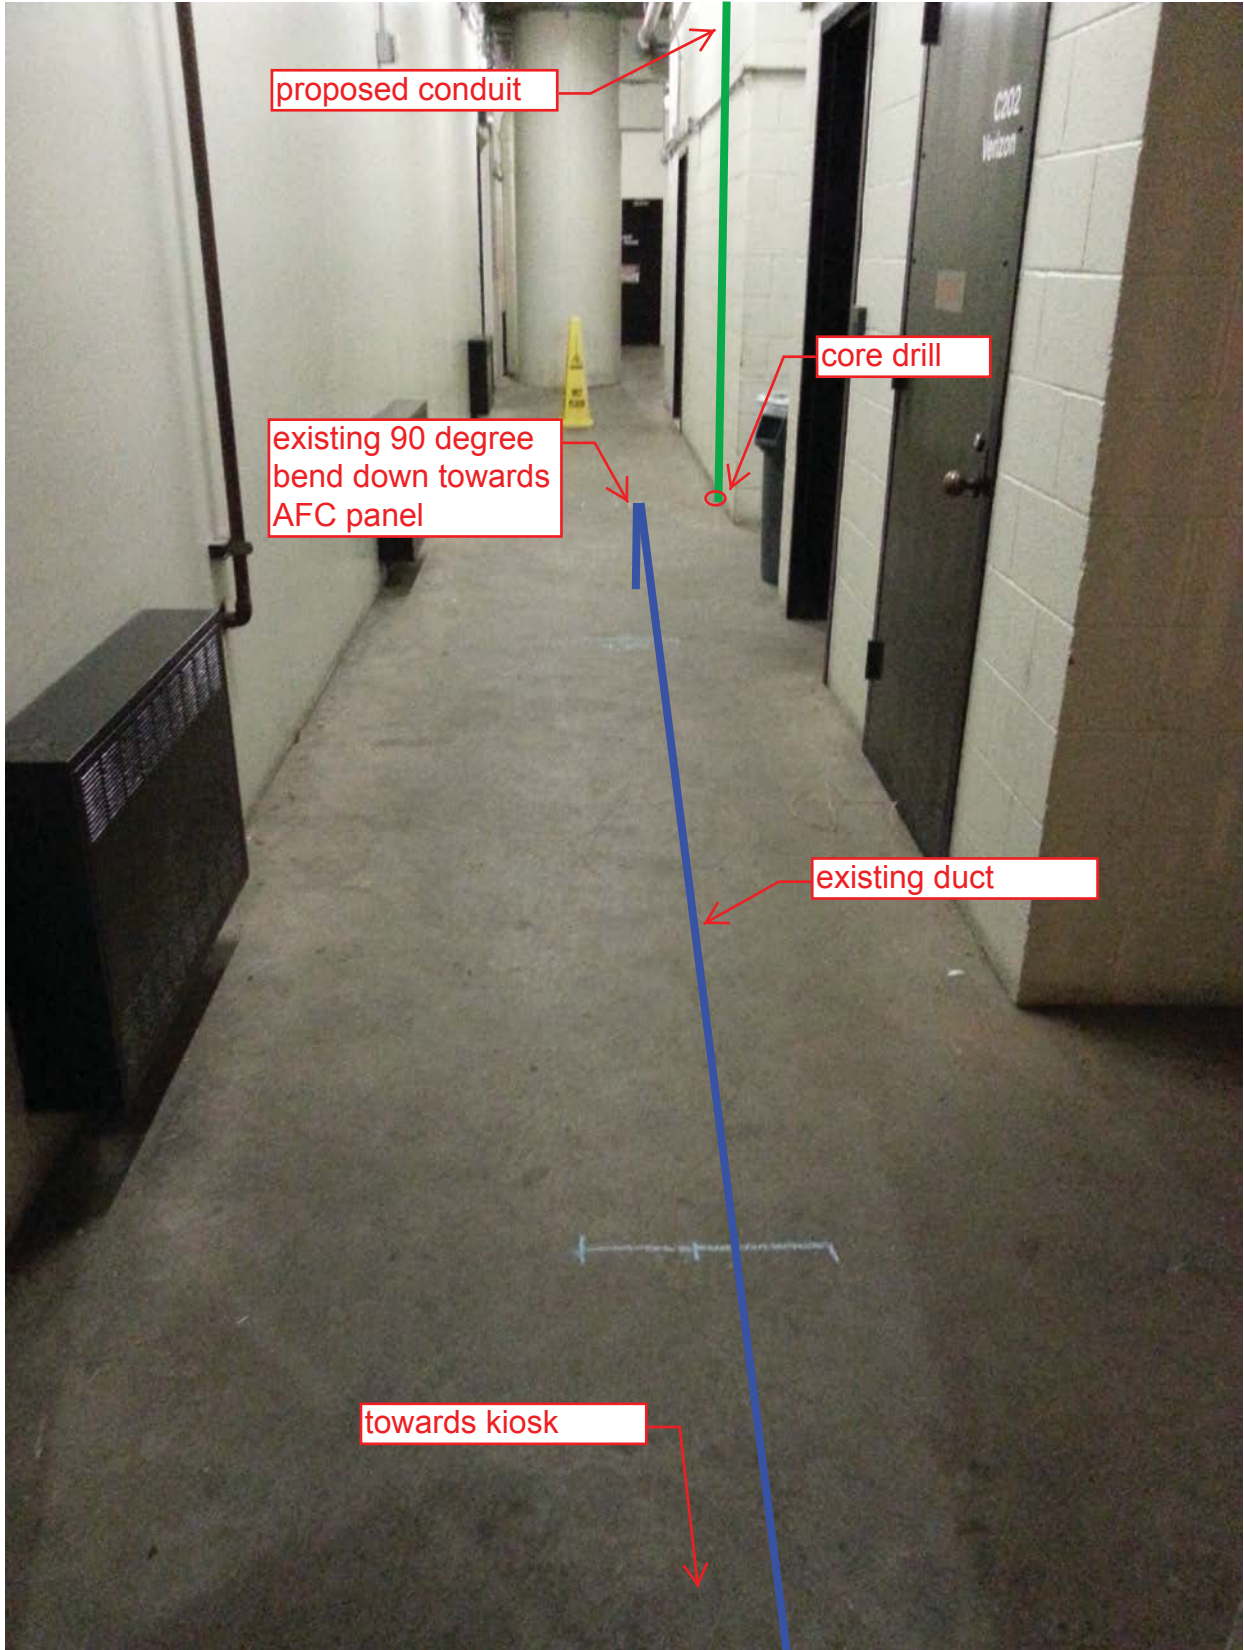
C13 King Street South: Existing duct and proposed conduit towards AFC panel on lower level
